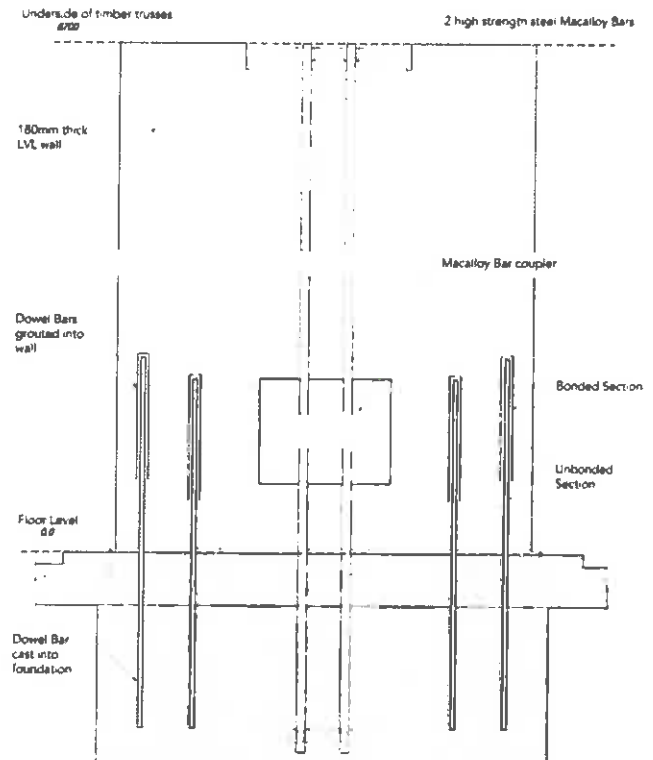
Pres-Lam wall section showing the 2.4 metre width and 6.7 metre height.
